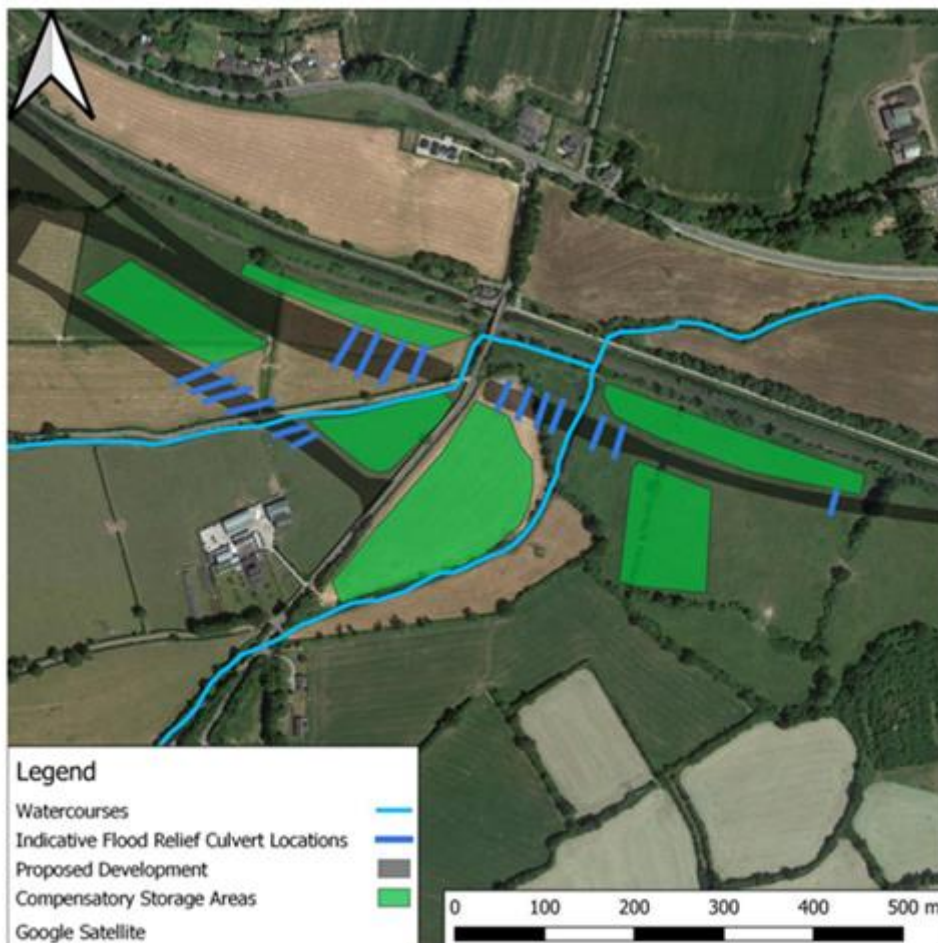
Proposed Compensatory Storage Area - Jackson's Bridge
